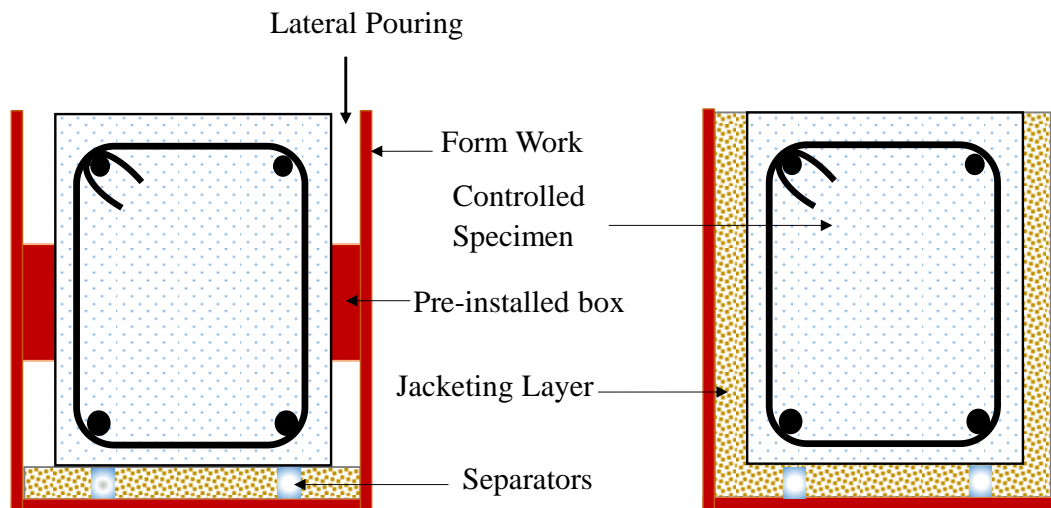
(a): Typical sectional details of the FRGC Jacketing
